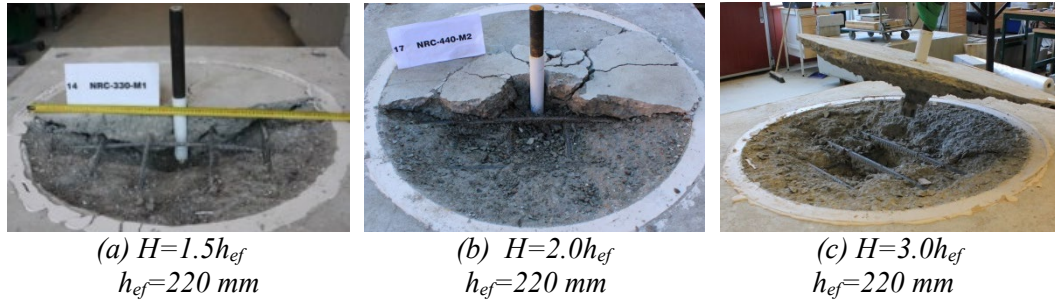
Crack patterns at tests for anchors in reinforced concrete members of various thicknesses.
